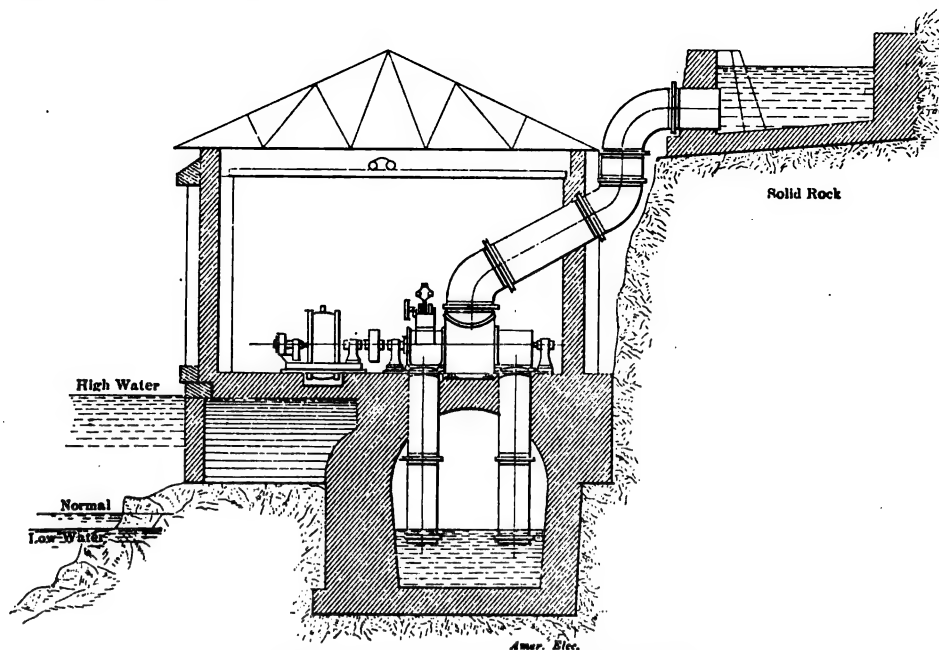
CROSS-SECTIONAL ELEVATION OF POWER HOUSE.
